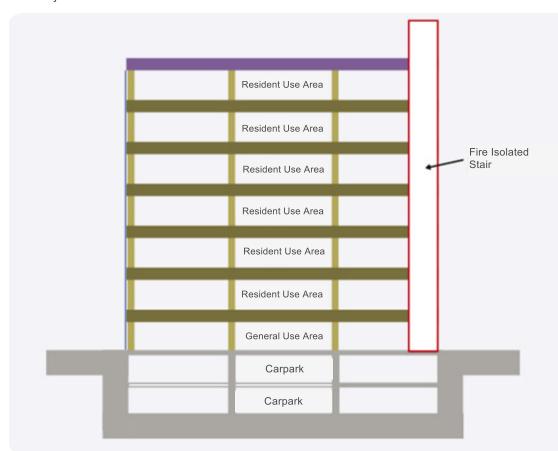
Typical Schematic Section through mid-rise Aged Care Building.
